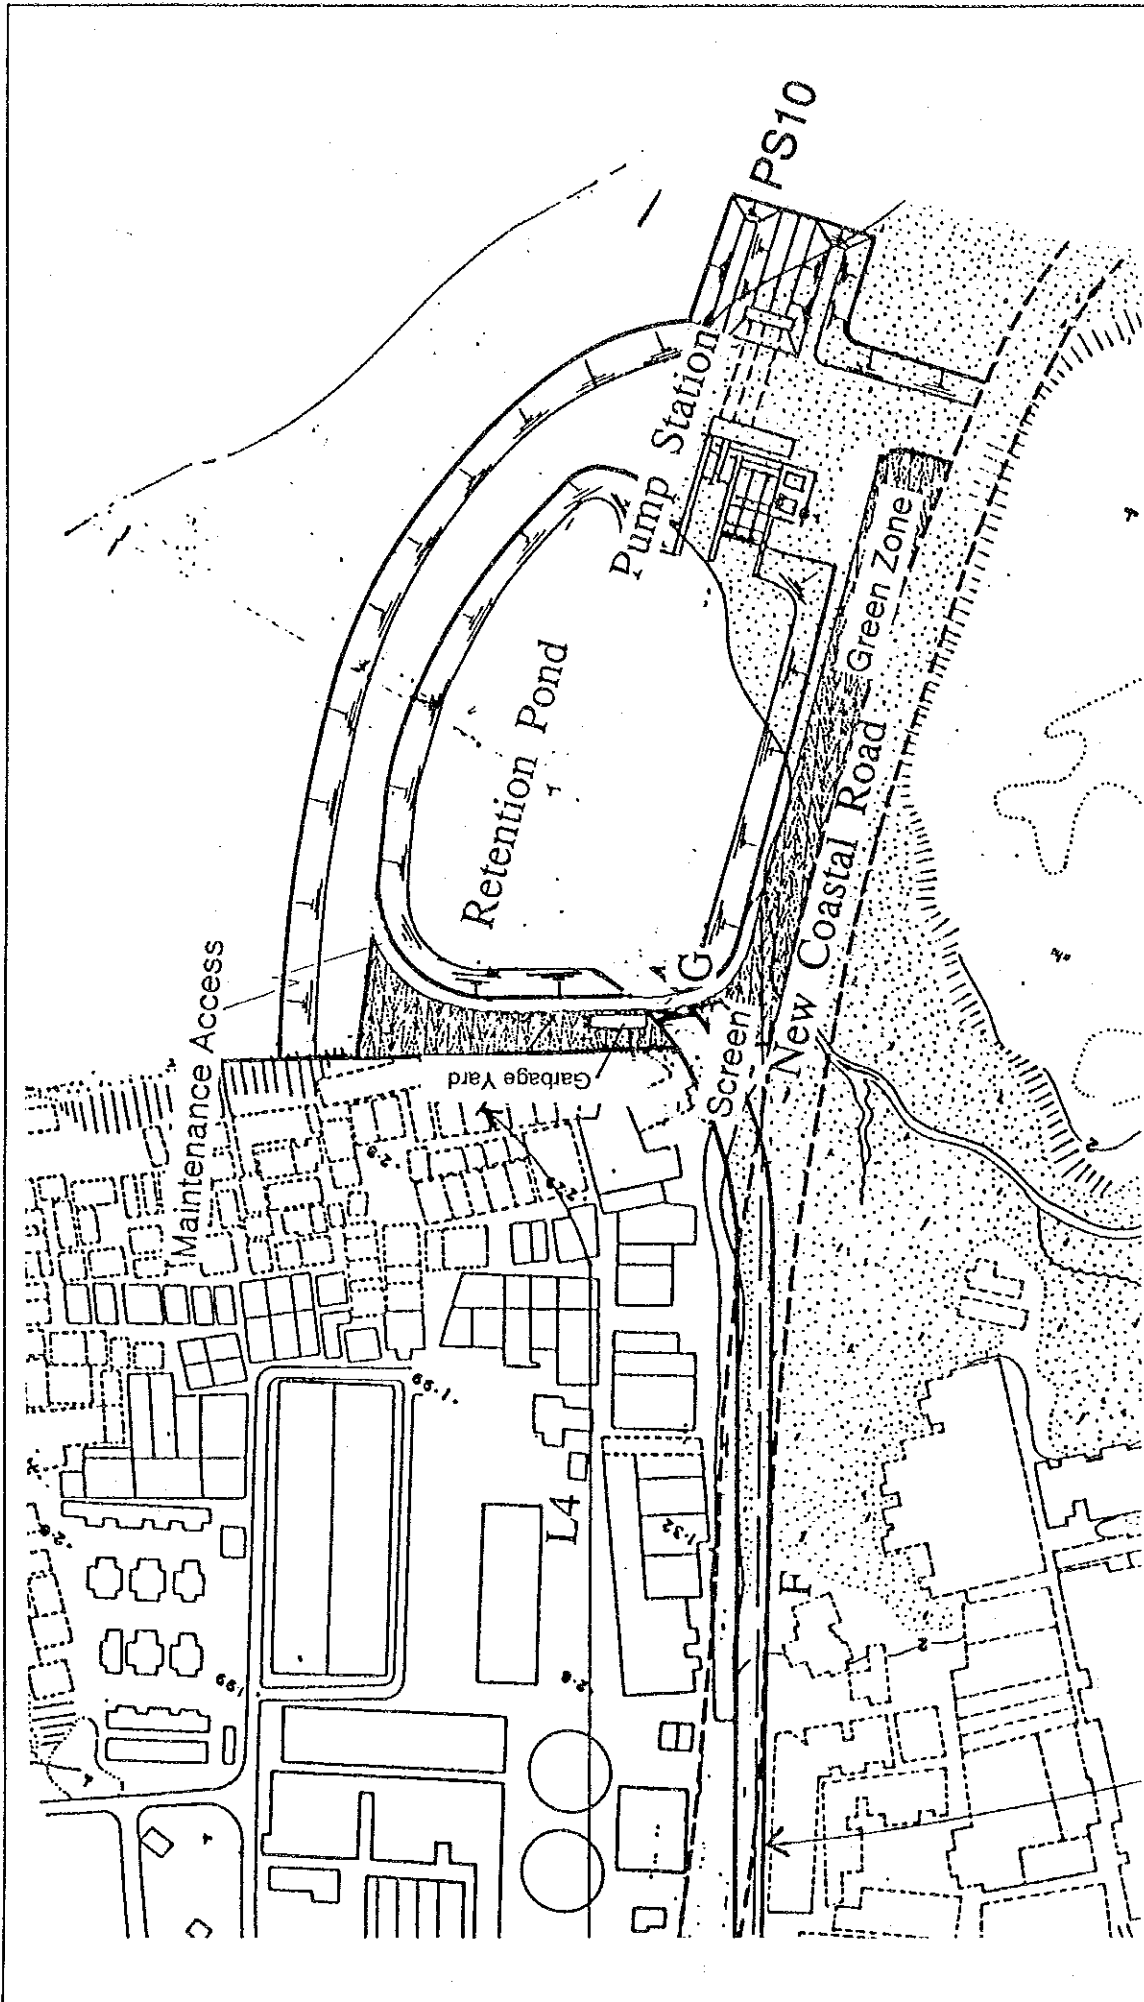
GENERAL PLAN OF S-10 RETENTION POND
